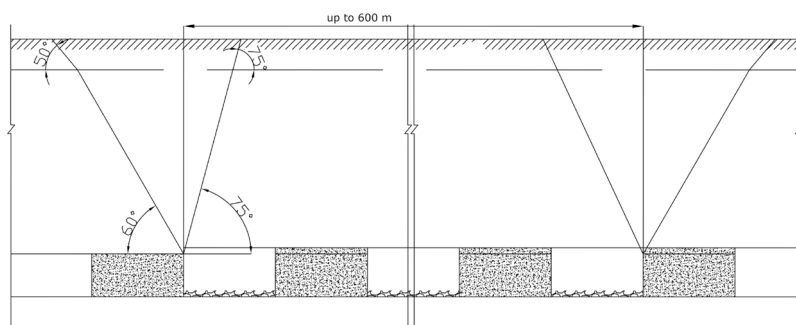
Cross-section of a mine with the room and pillar mining technology.
